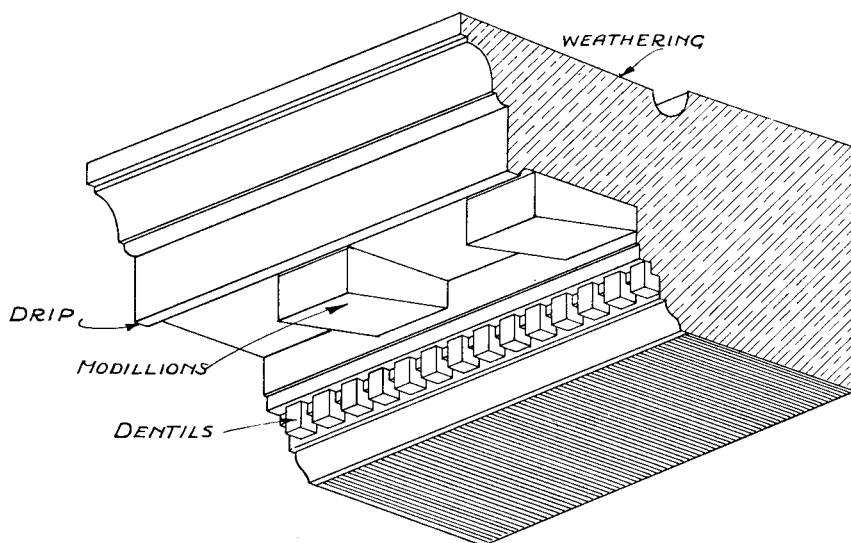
DETAIL OF A PIECE OF CORNICE IN ONE BED.
